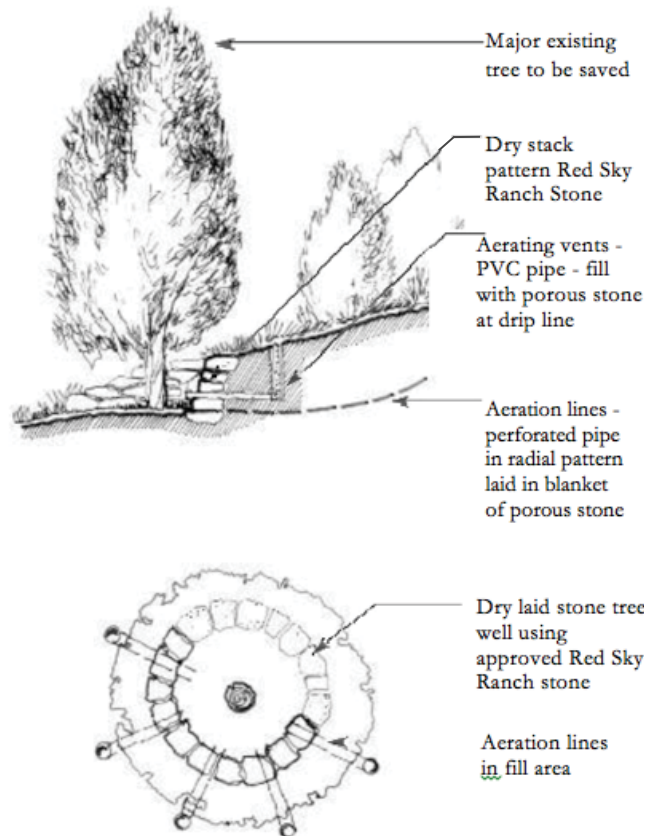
Tree Well Design when adding fill under Drip Line
